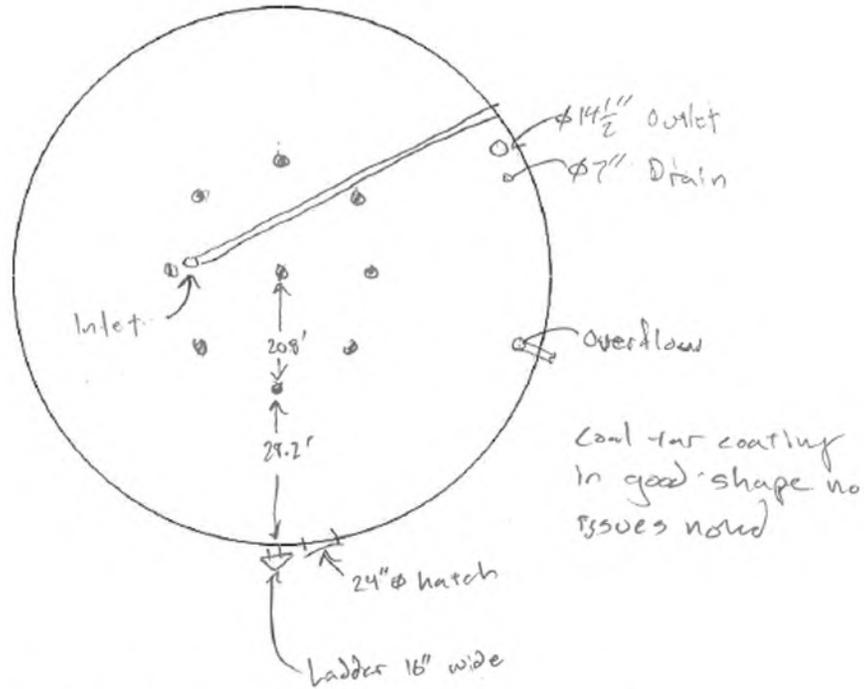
Reservoir Roof – Sketch location of roof supports, hatches, vent, columns, etc.
